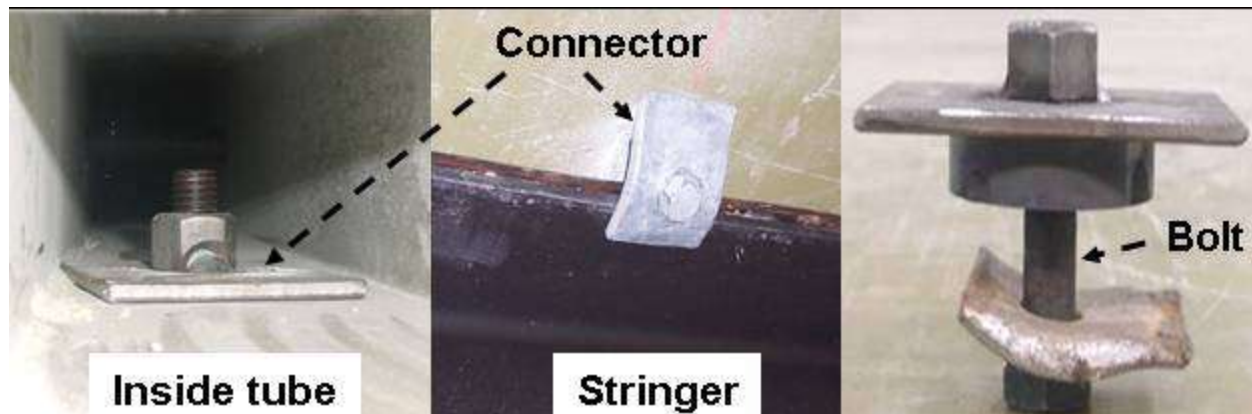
Deck-to-girder connector used in Hawthorne Street Bridge
